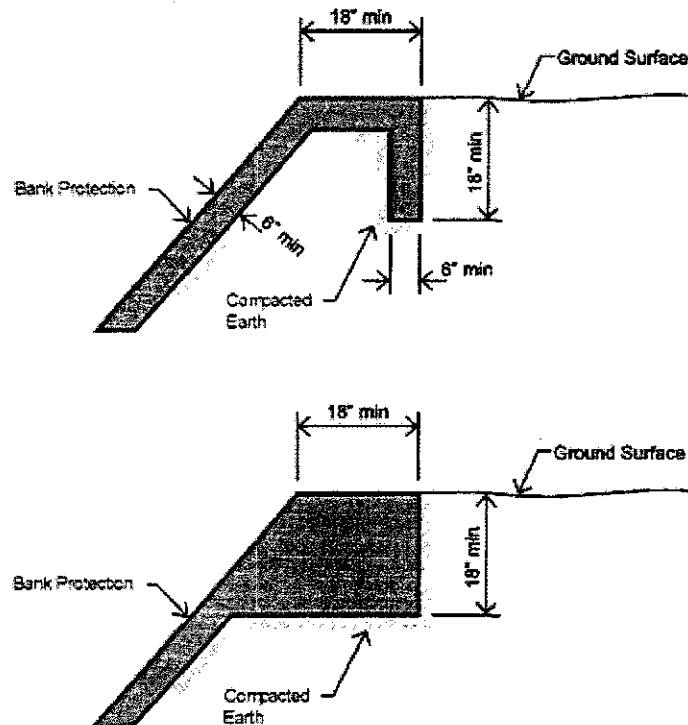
Typical Bank-Protection Key-Ins (Not To Scale)
